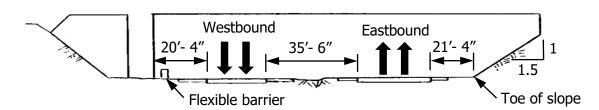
Bridge elevation view of horizontal clearances for separate westbound and eastbound highway features below the bridge, with flexible barrier.
